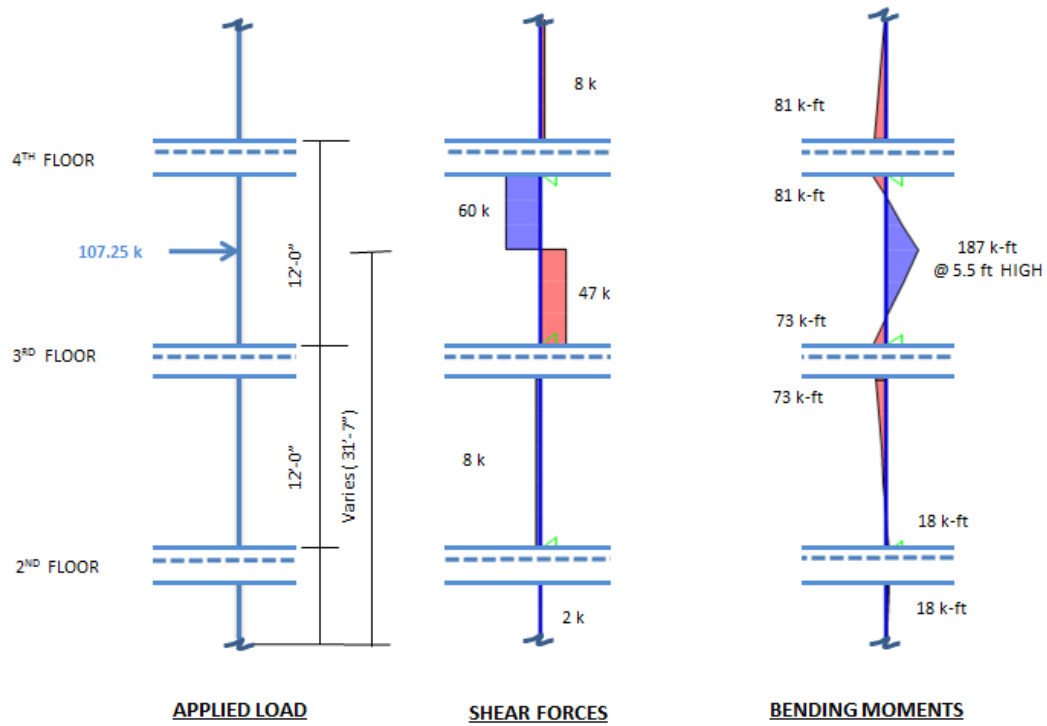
Impact load applied at $d + h_c$ away from the end of column on the 3rd floor
